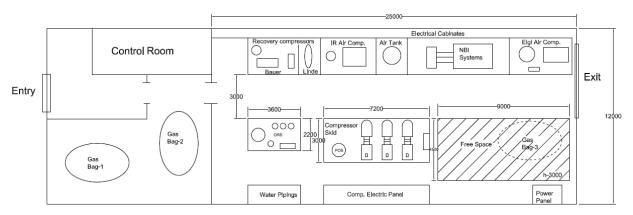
Available space dimensions and layout drawing at IPR Compressor Hall
